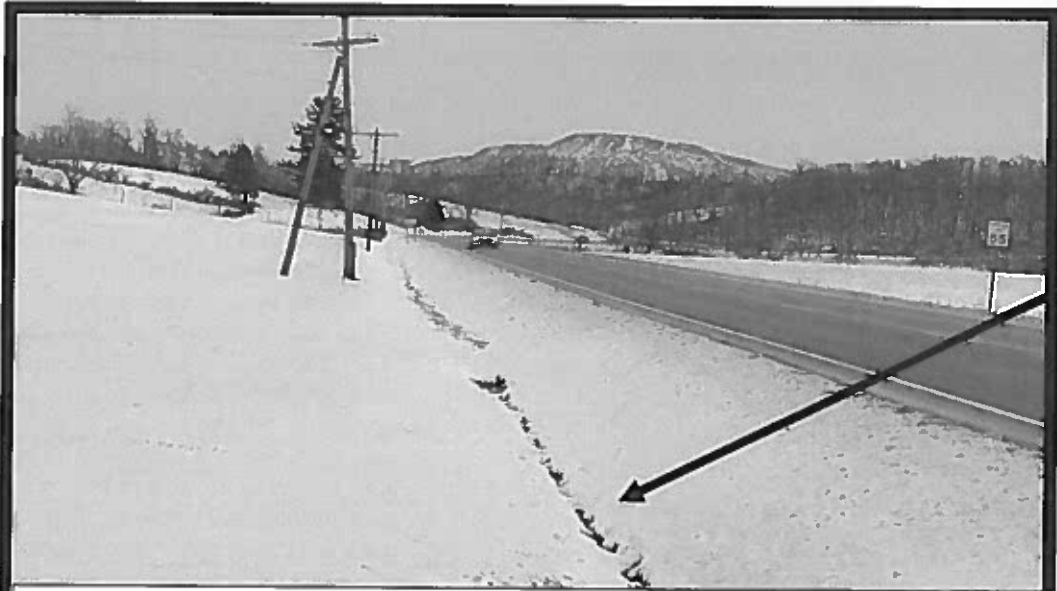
County Road 11 driving east toward Cadiz. Pipe will be installed on the north side of the road as indicated. Residences on right side of road are indicative of the style of homes along this route.
